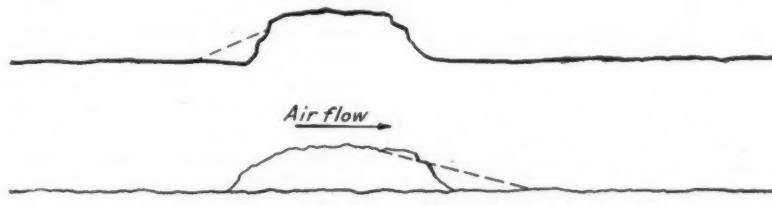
Hollow made by roof fall should be slanted on the upstream end
